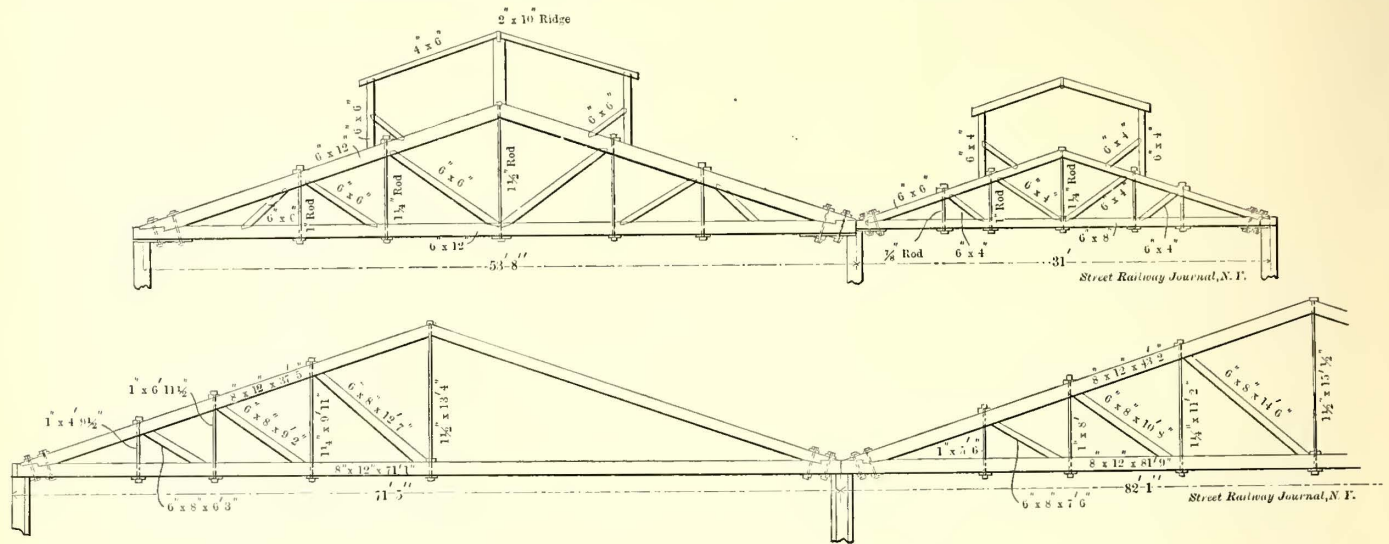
WOODEN ROOF GIRDERS—VERNON STREET CAR HOUSE
